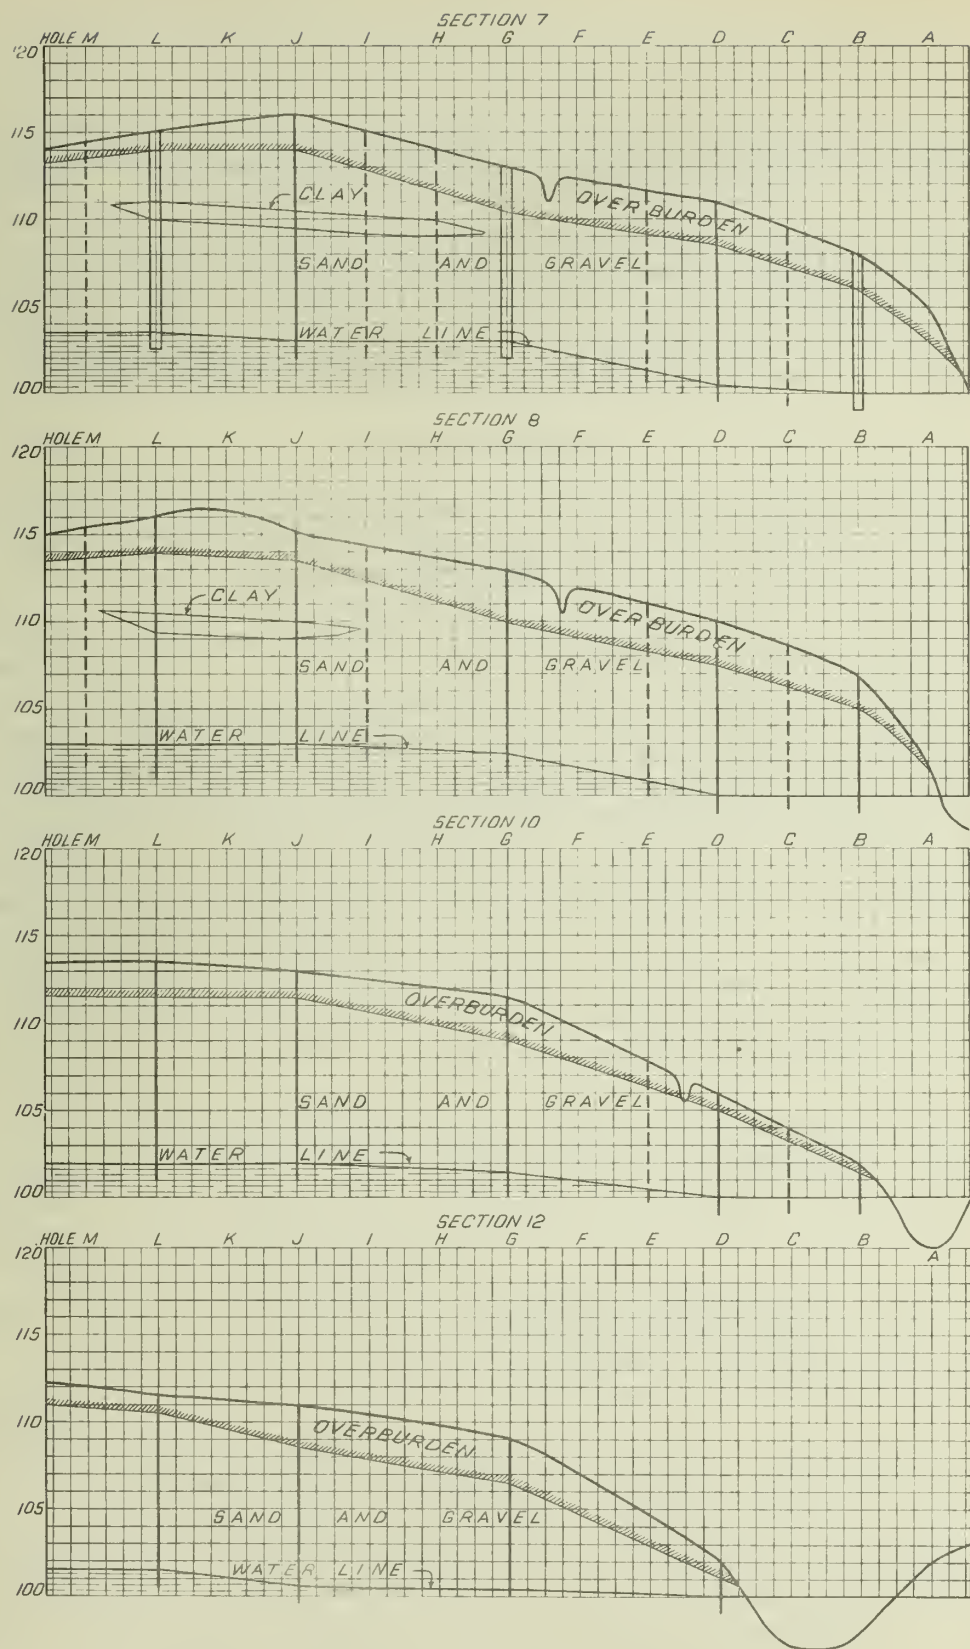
Sections of deposit, showing character of material encountered by test pits and drill holes
